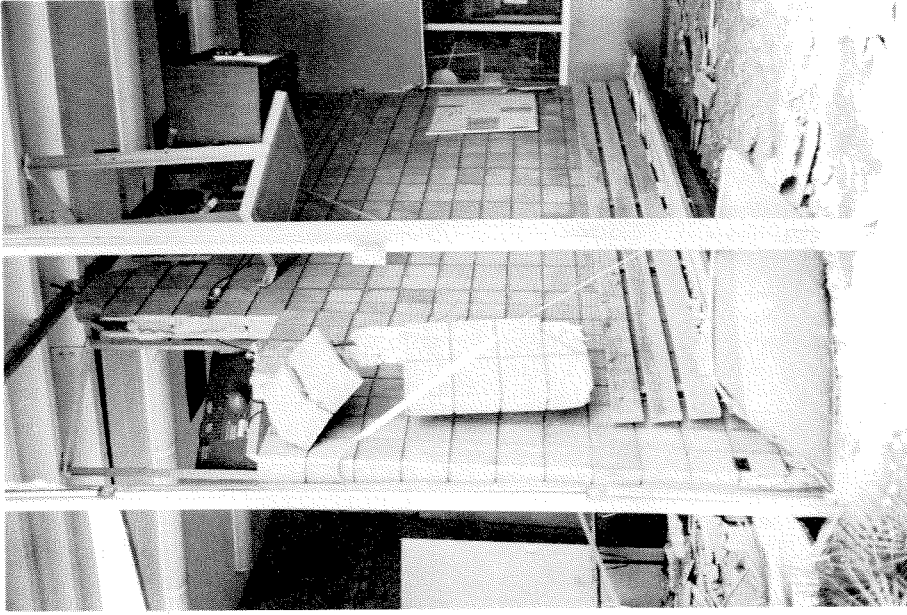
Damage to concrete-block wall. San Fernando Juvenile Facility.
